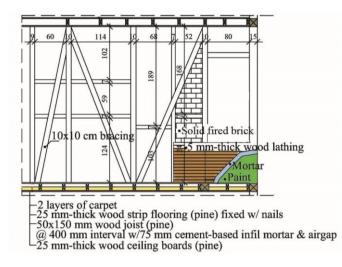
Elevation of Semi-Repaired-Wall 2 & Section of Semi-Repaired-Floor 2 in 1/50 scale (Drawn by author).
